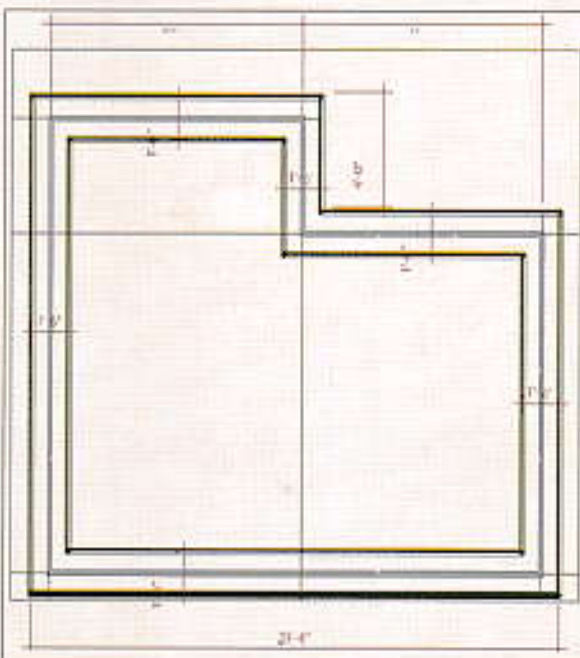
LAY OUT PLAN OF KITCHEN AND TOILET (FEMALE ZONE)
